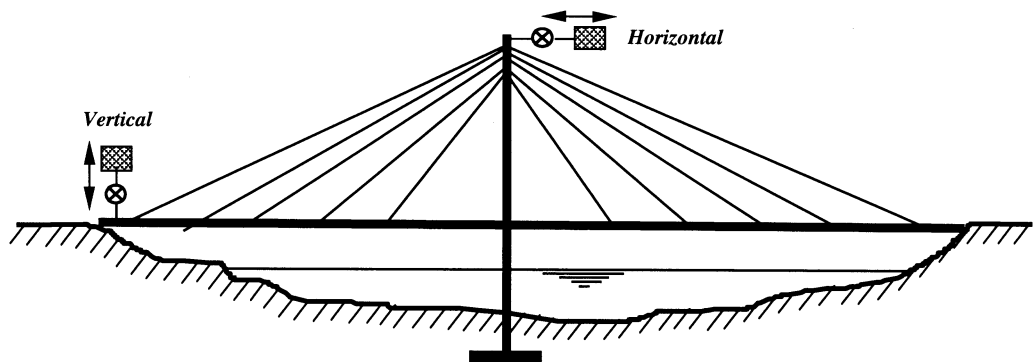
Active mass damper on cable-stayed bridge.
